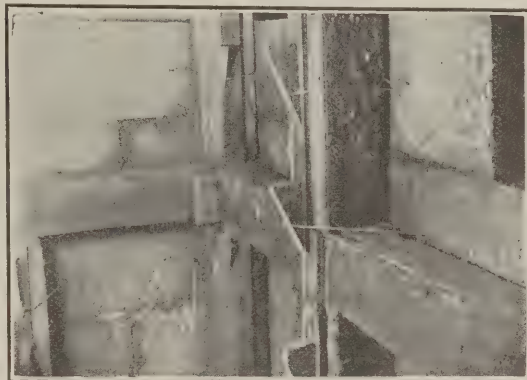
Detail Showing Construction at Corner of a Wall.
